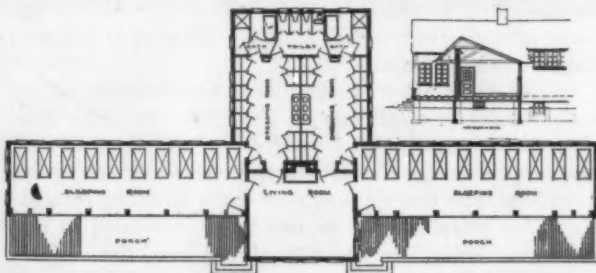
AND 7—LOOMIS SANATORIUM. ORIGINAL IMPROVED LEAN-TO AND FLOOR PLAN
